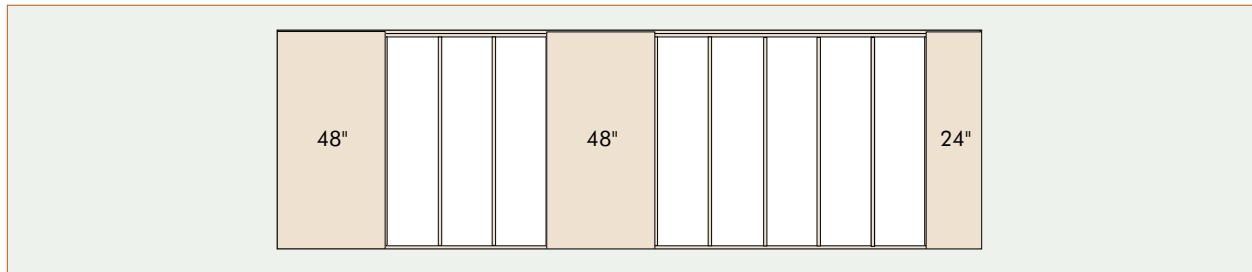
Panel layout detail of north and south wall for Tests 5b and 5b(C). The 24-inch segment served as the corner return for the east wall.
